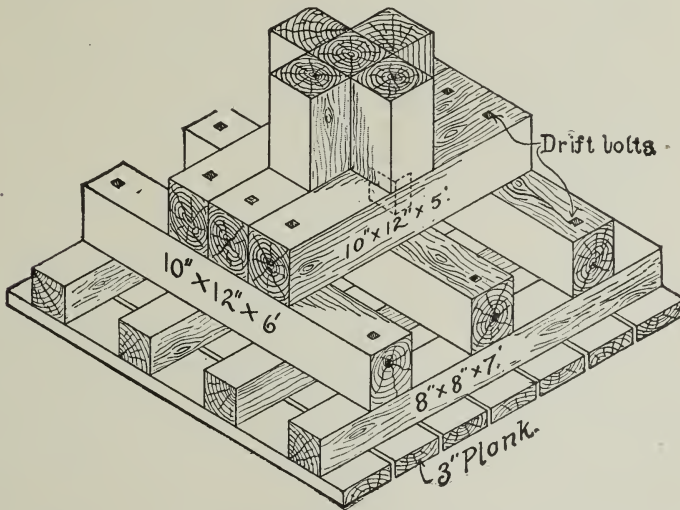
Temporary Timber Column Foundation. World's Fair Buildings, Chicago, 1893.
